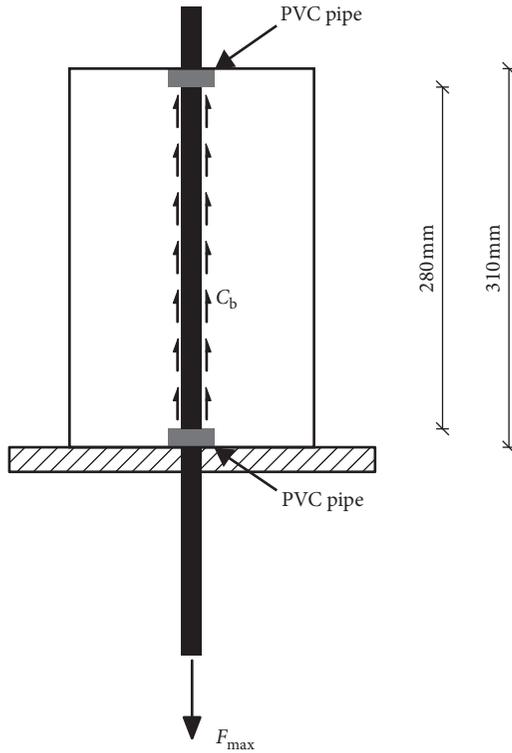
Calculation of mean bond strength between steel and concrete (pull-out test).
